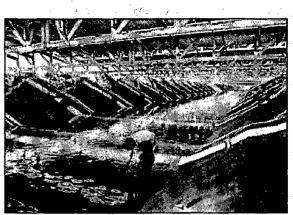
Man working under the installed solar apanels over the Narmada branch drain
